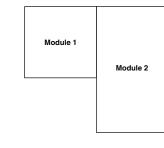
"T" shaped modular design Note A: Overall building dimensions can exceed 42 feet. The vertical dimensions from the eave to the ridge roof shall not exceed 23 feet.
